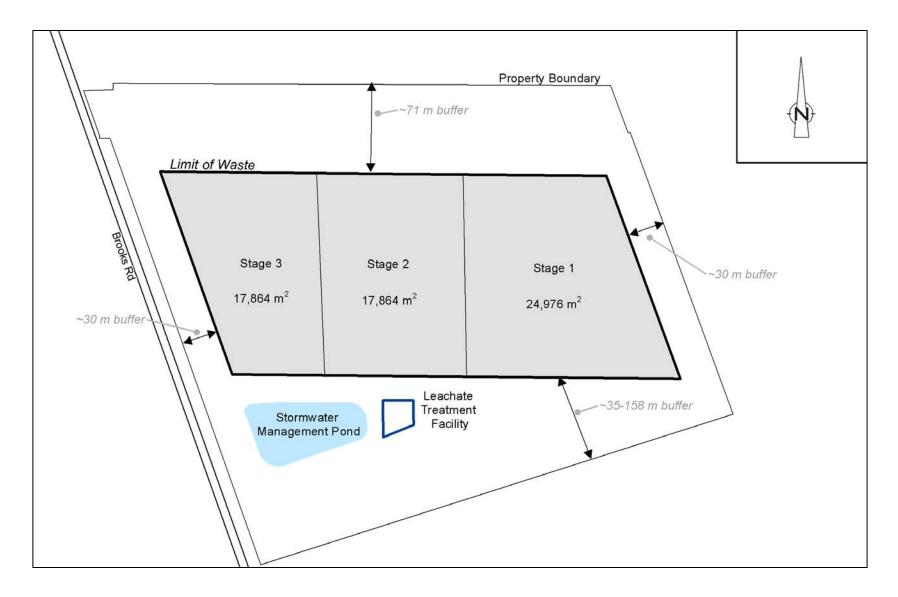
Existing Brooks Road Landfill Site & Approved Buffer Areas
